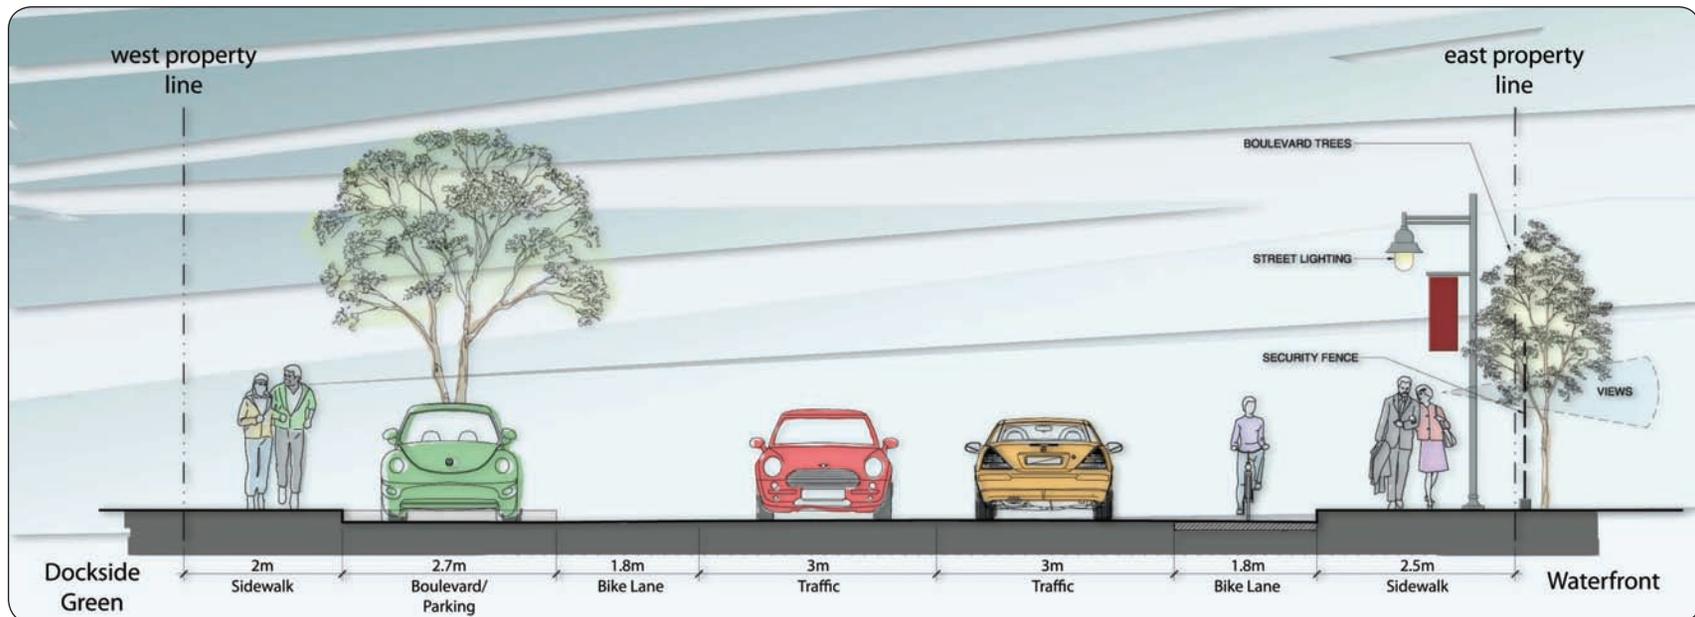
Illustrative Plan: Cross-section and Conceptual Alignment for Harbour Road – Looking North
